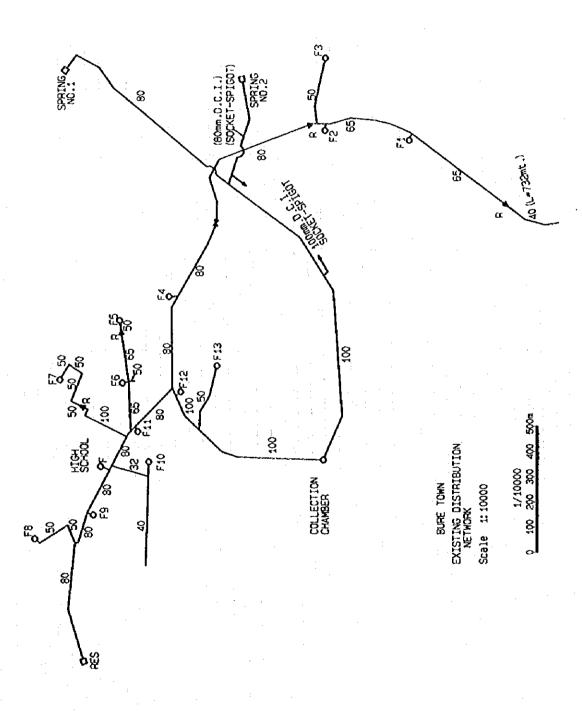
Schematic layout of Existing Facilities (No scale)
